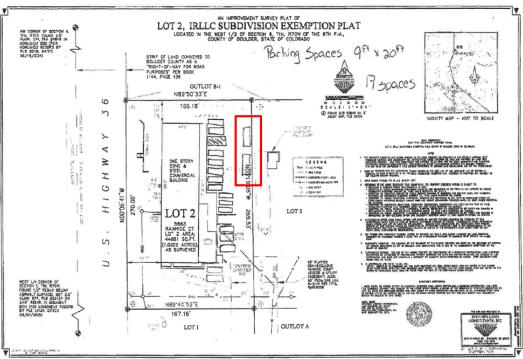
Site plan submitted by the applicants. The two parking spaces recommend for removal are indicated in red.
